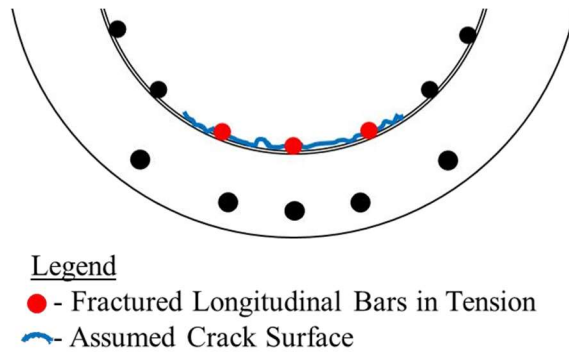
Assumed Crack Shape for Lap-Splice Failure.
